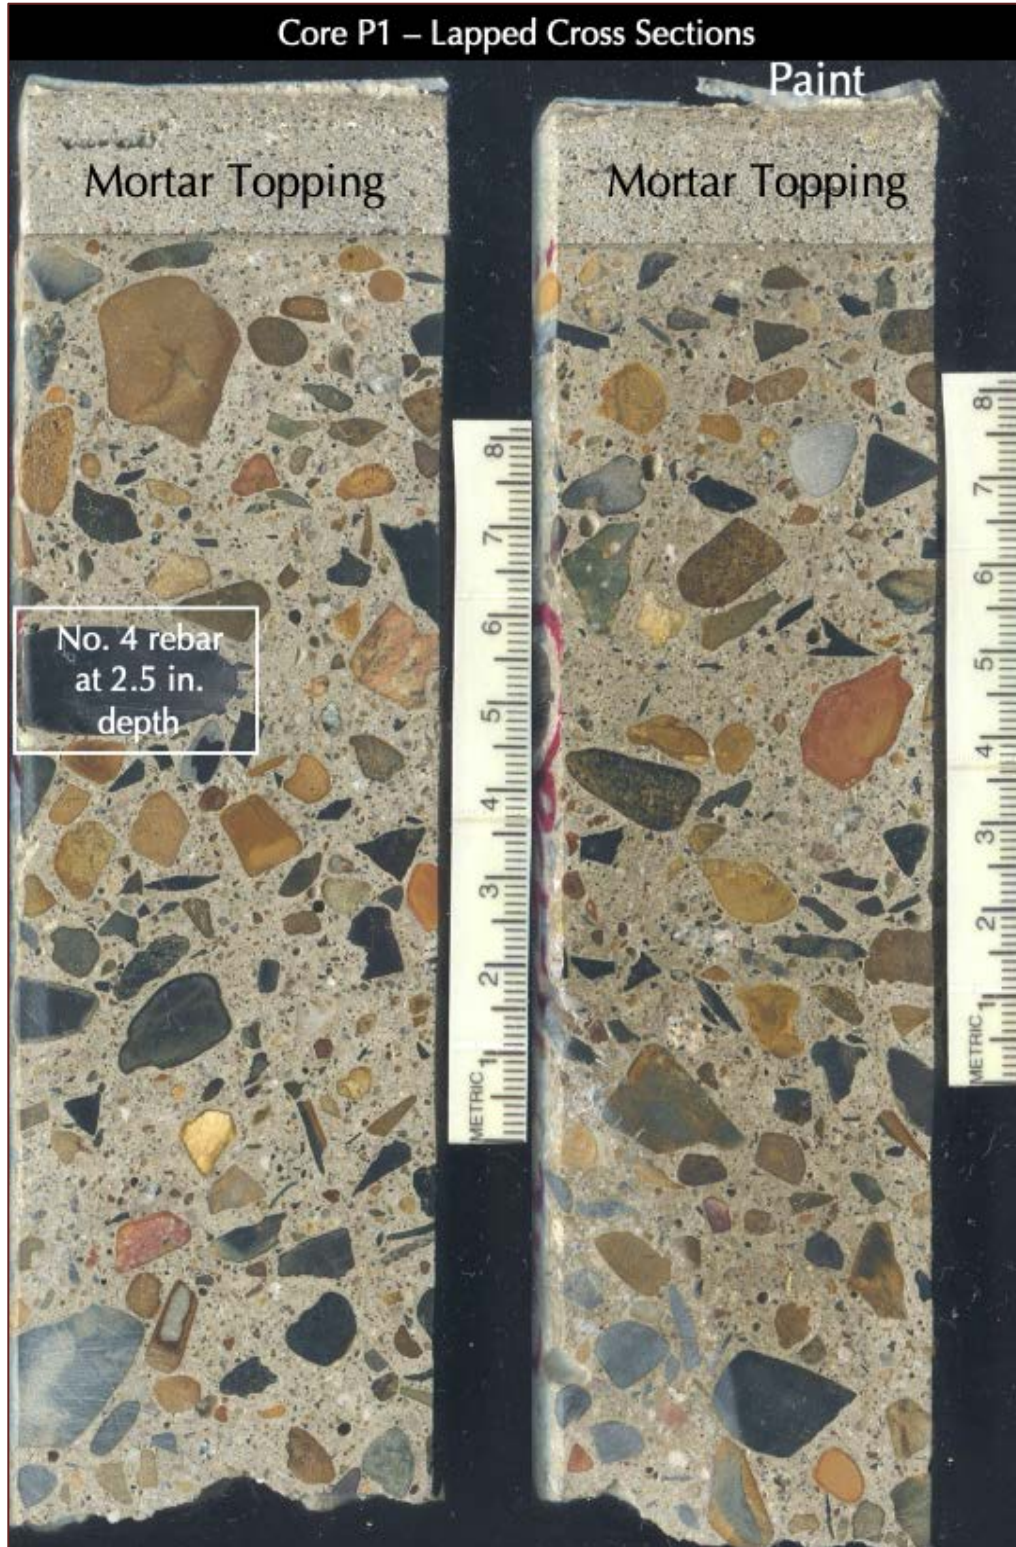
Two parallel lapped cross sections of Core P-1 from West Wall showing:
